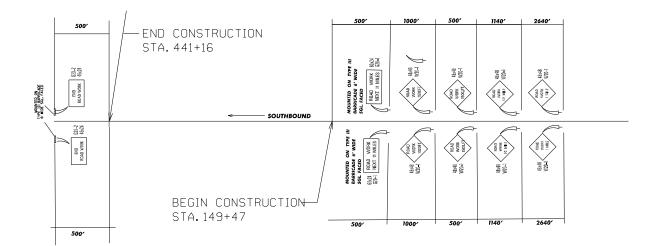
DETAIL OF CONSTRUCTION SIGNING NORTH BOUND NH-0002-03(094) / 108175 301000
